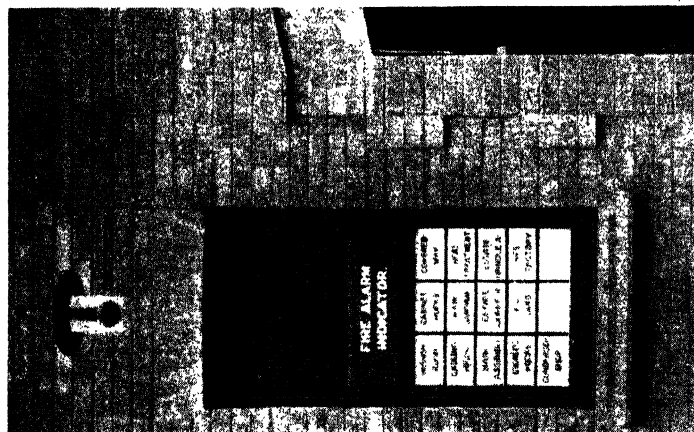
B. WORKS FIRE ALARM INDICATOR BOARD
